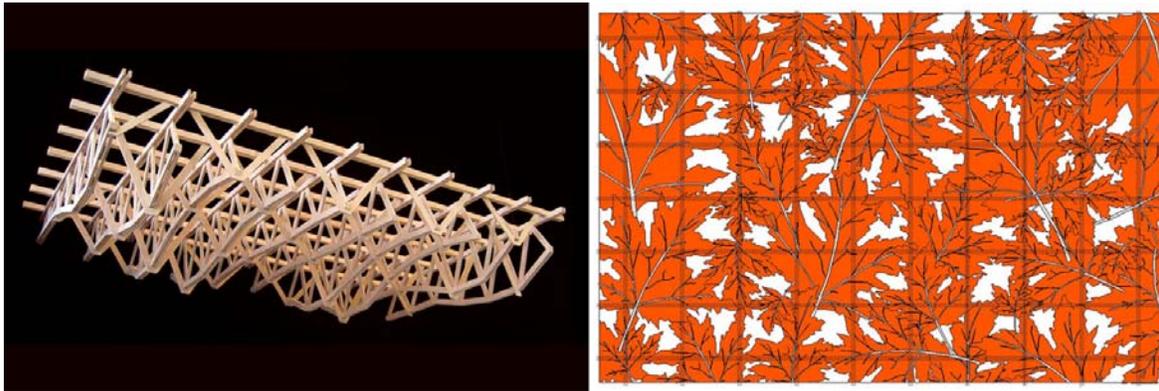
Initial space-truss configuration and perforated horizontal plywood diaphragm
